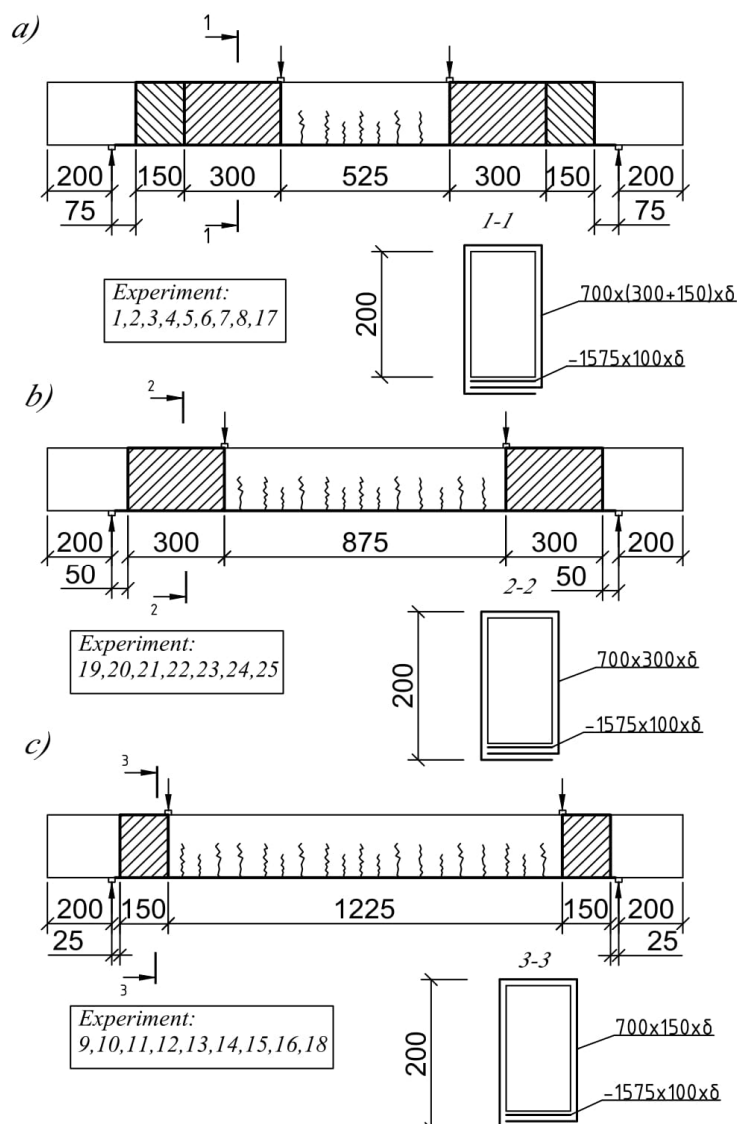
Patterns of strengthening the lower tensioned zones and support areas of the damaged r.c. beams of 3rd series with large (a), medium (b) and small (c) shear spans
